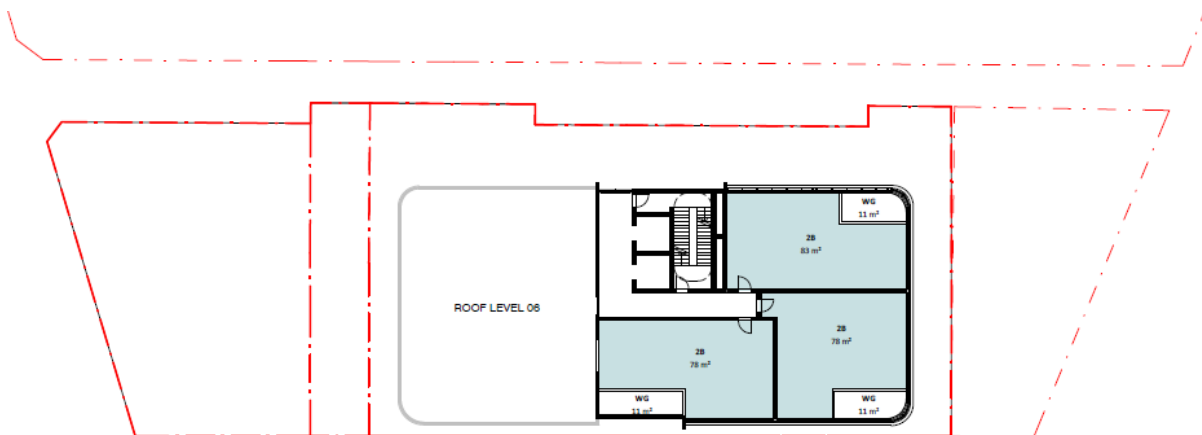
Concept Reference Scheme – Level 4 -8 Floor Plans
